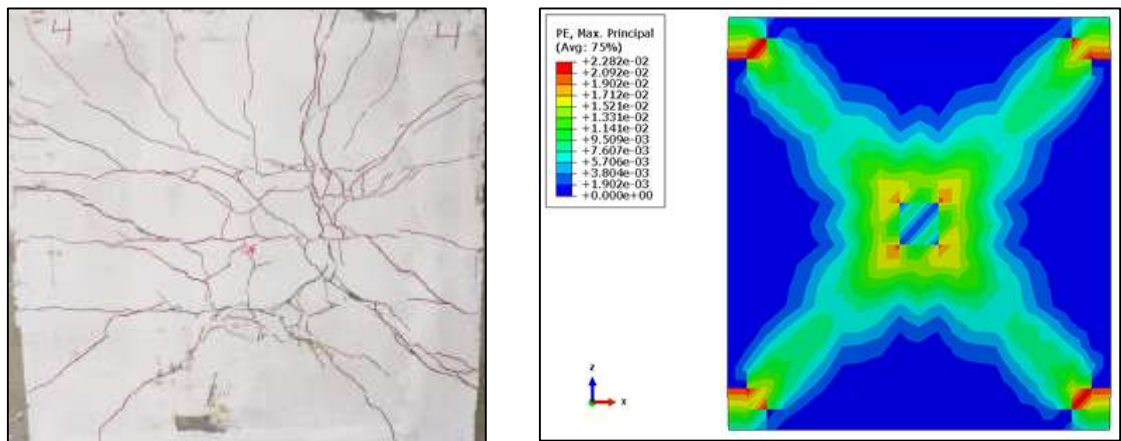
Cracking pattern on tension surface at ultimate monotonic load for specimens HFRCP1.
